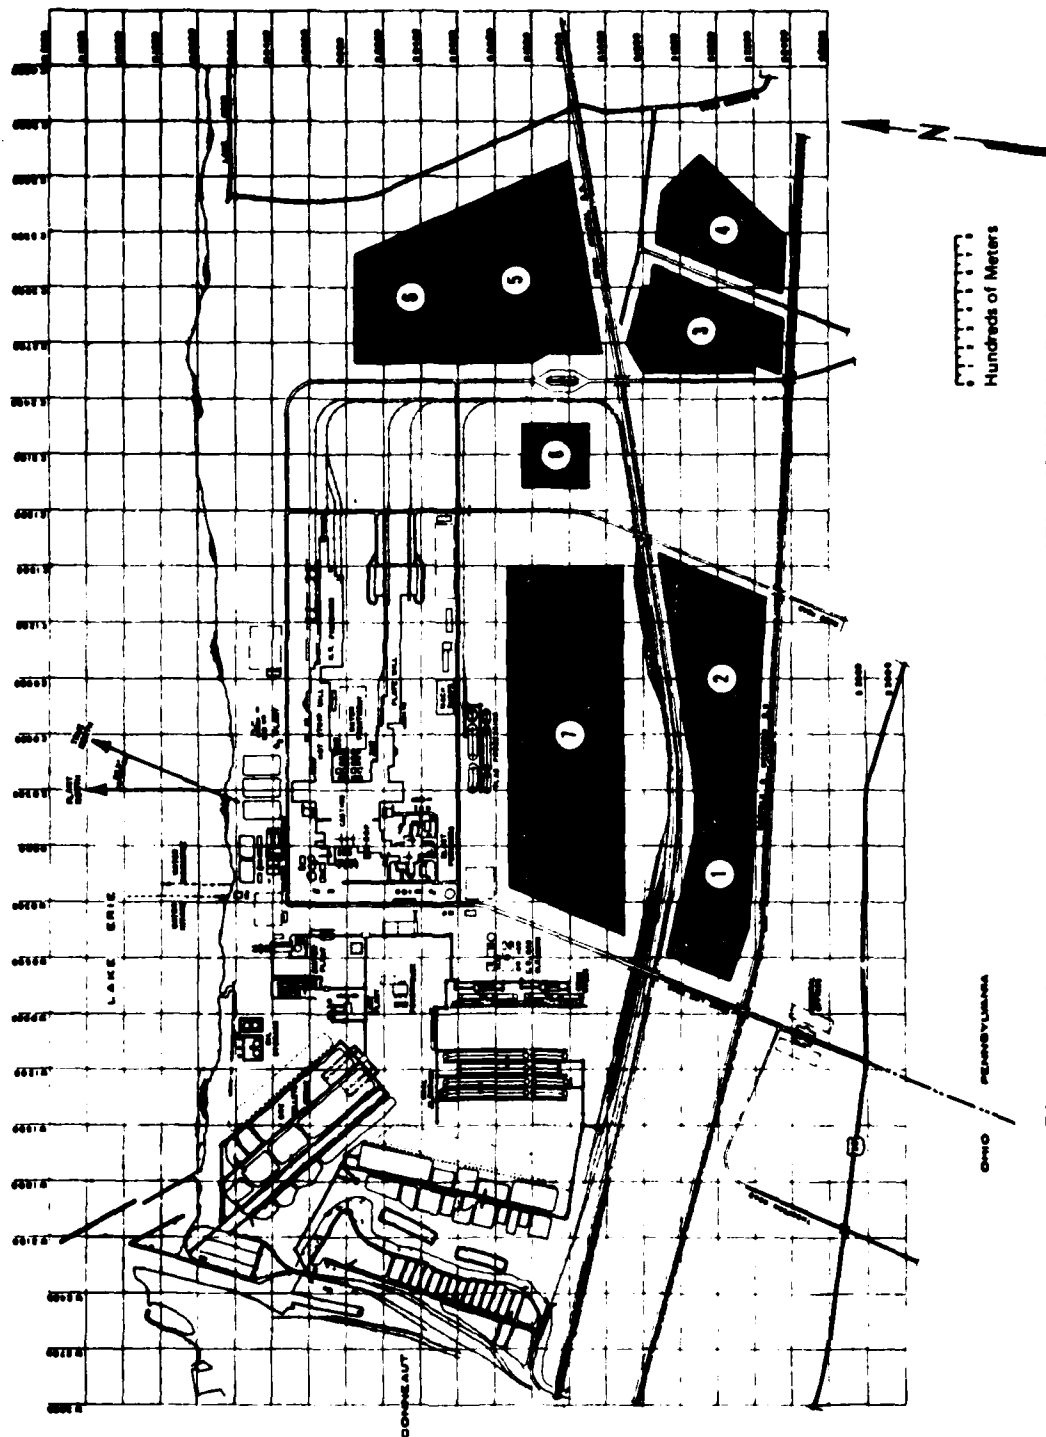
AVAILABLE ON-SITE SOLID WASTE DISPOSAL AREAS
